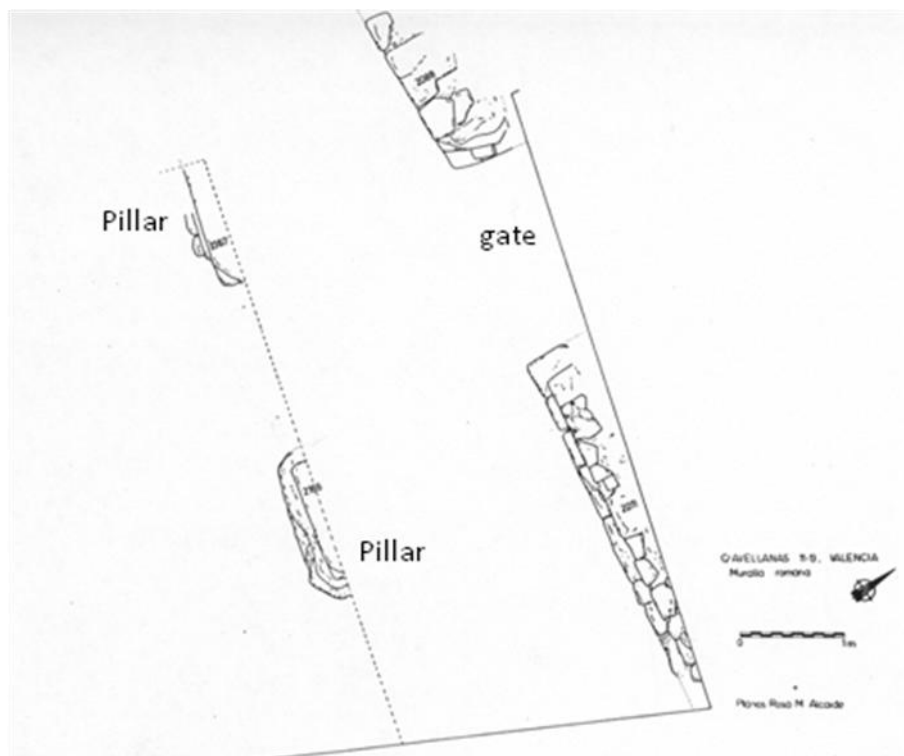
Valencia: Plan of the excavations at Carrer Avellanes, which may show two aqueduct pillars in front of the south gate (Algarra et al. 1993).
